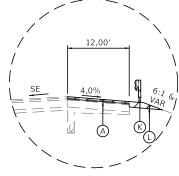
+00.18 TO STA. 1134+86.94
